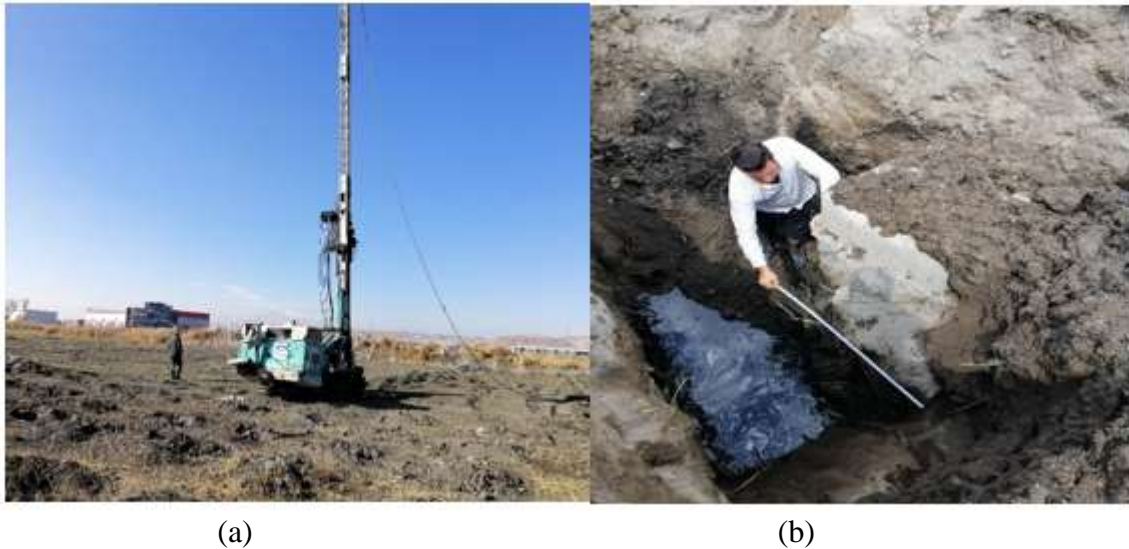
Jet grouting column, (a) Jet grouting machine, (b) Casting grouting column.
